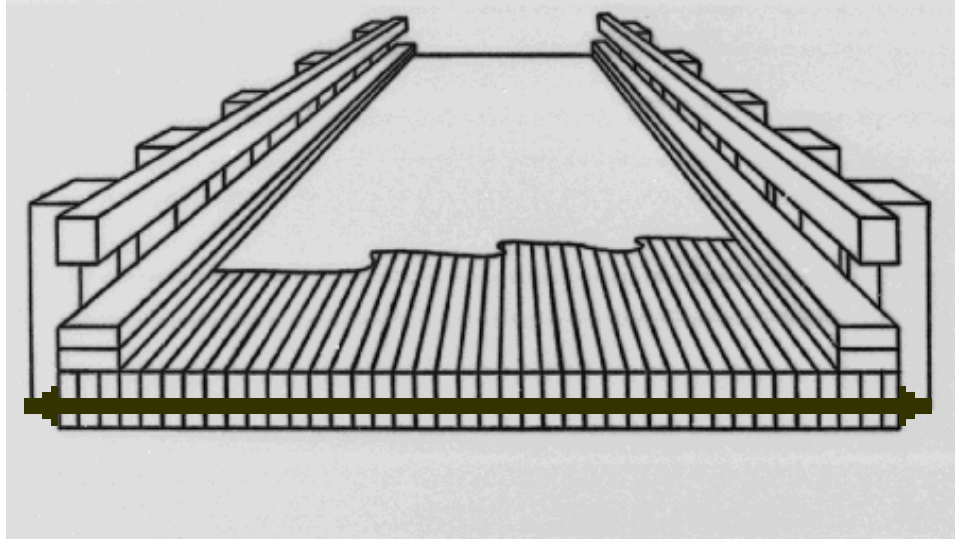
Typical Section of a Stress-Laminated Timber Deck Bridge
